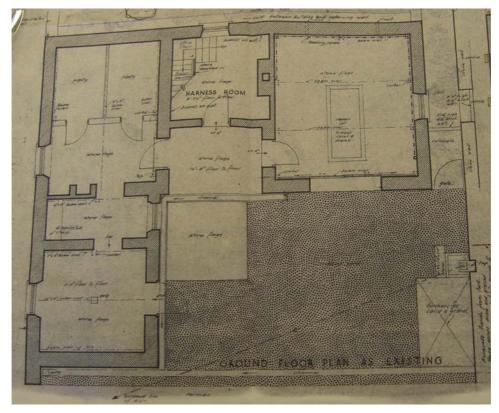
Coach House ground floor plan as existing in 1966 (BDB 33/12/9 1966-9)
